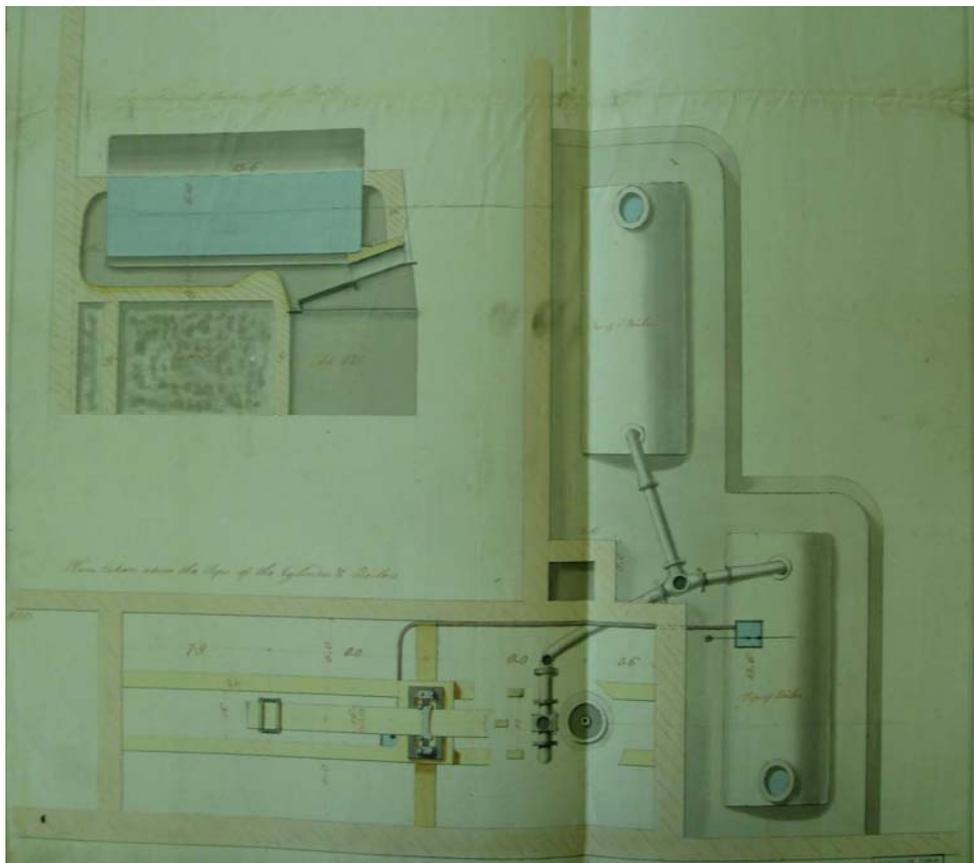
Plan of 1799 engine and boiler houses, showing detail of boiler
